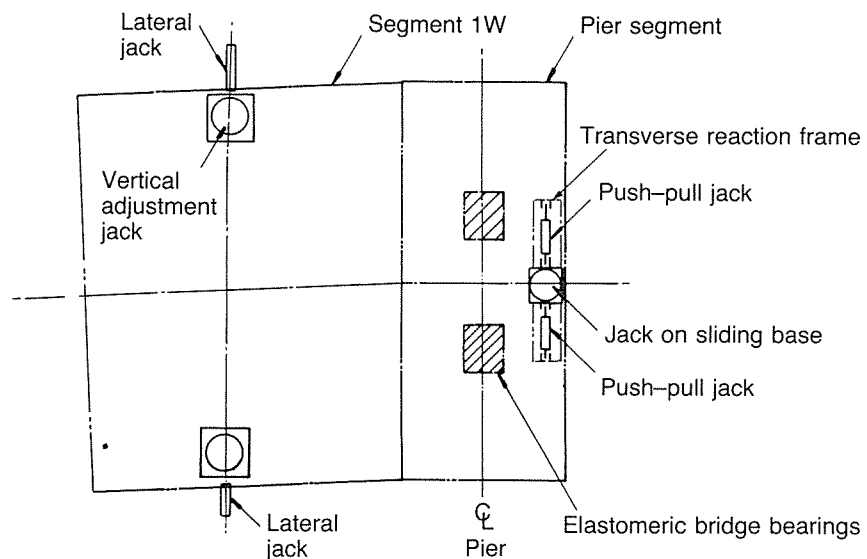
Schematic plan view showing segment adjustment system on pier brackets
